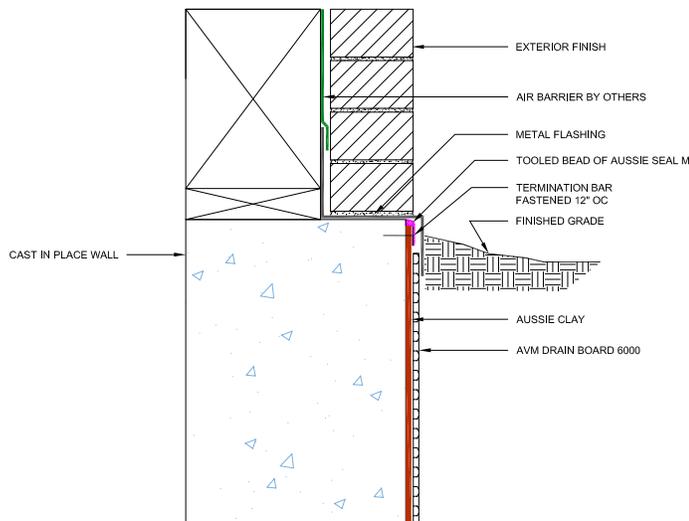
TYPICAL TERMINATION AT BRICK LEDGE
